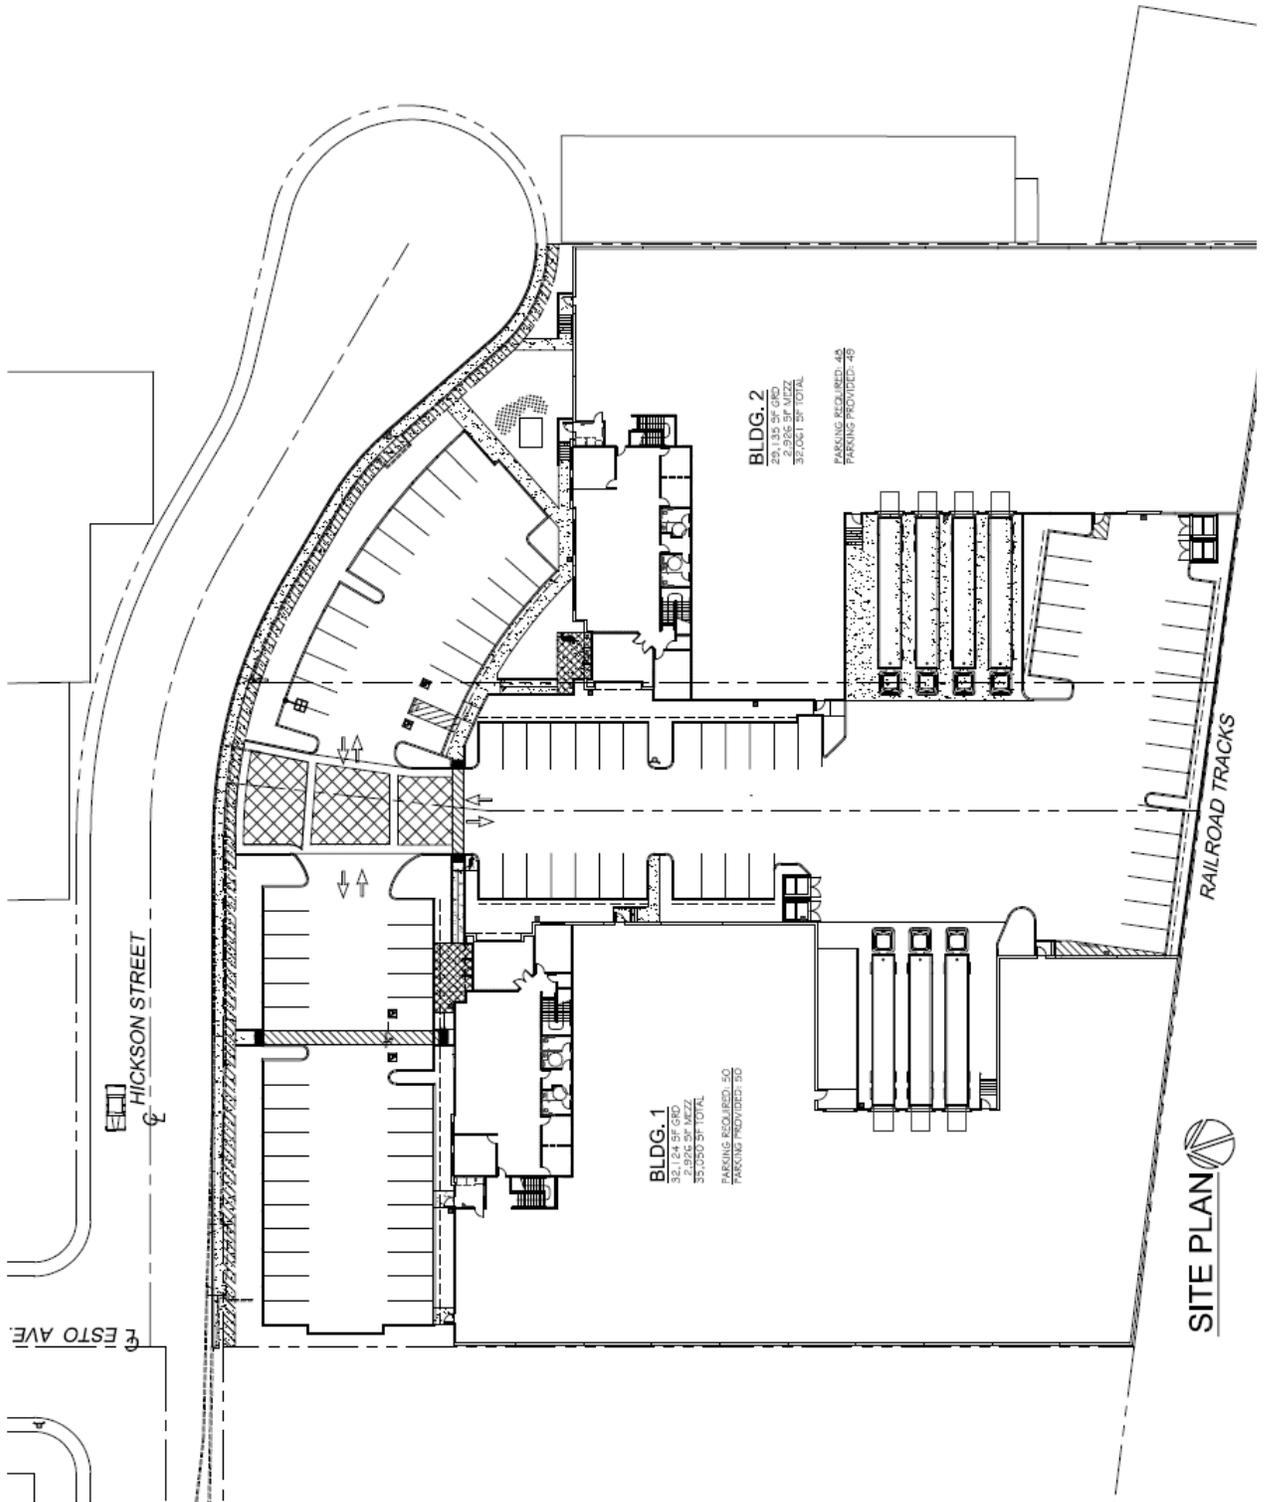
PROPOSED PROJECT SITE PLAN
